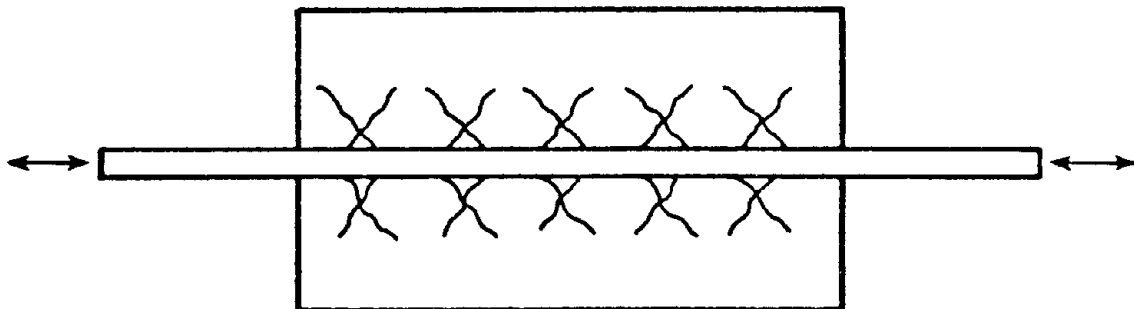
DIAGONAL CRACKS UNDER CYCLIC LOAD
